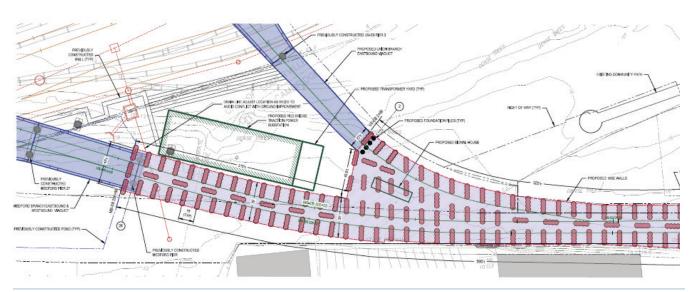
Proposed Ground Improvement along section of MSE Embankment between Piers 20 and 26.
